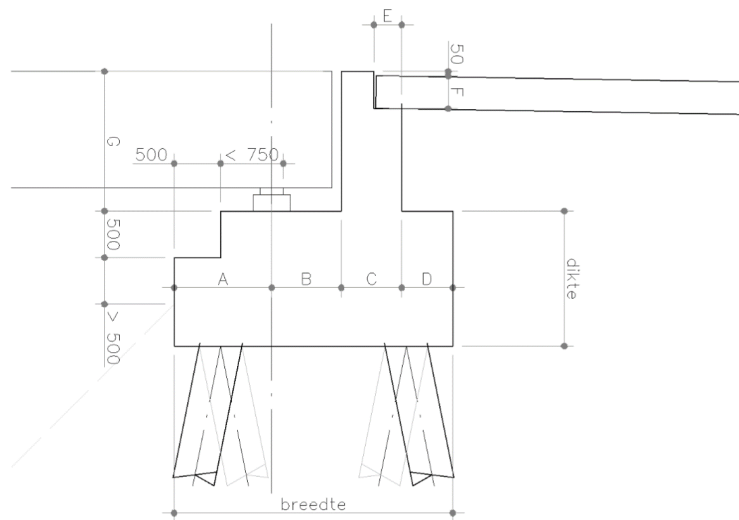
Traditional cross-section of an abutment footing (bank seat type)
